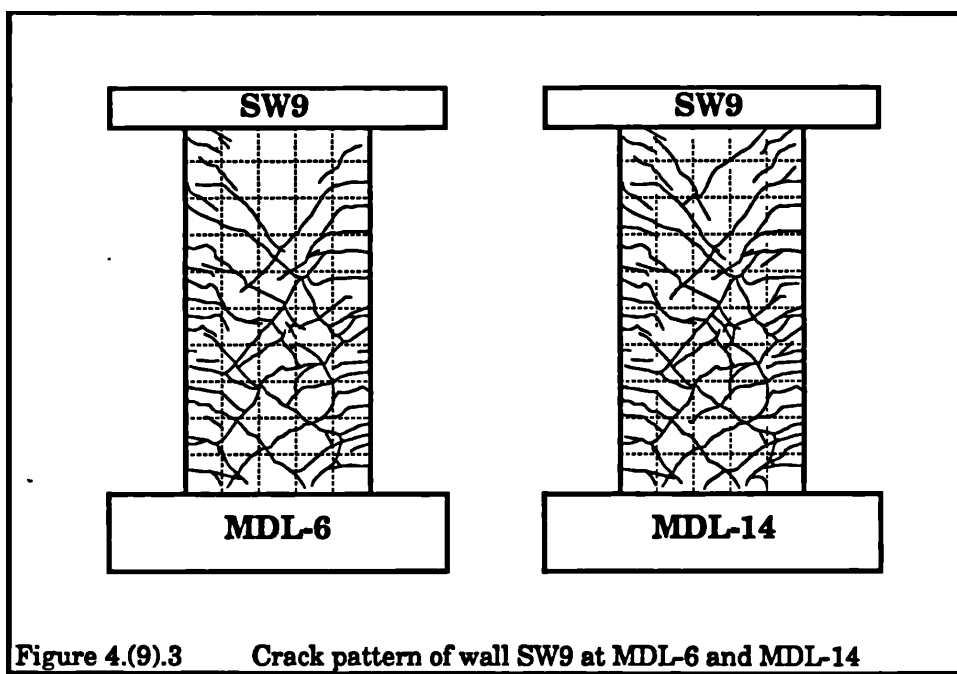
PilaSW9: DSr4 - cracks at MDL-6 and MDL-14
